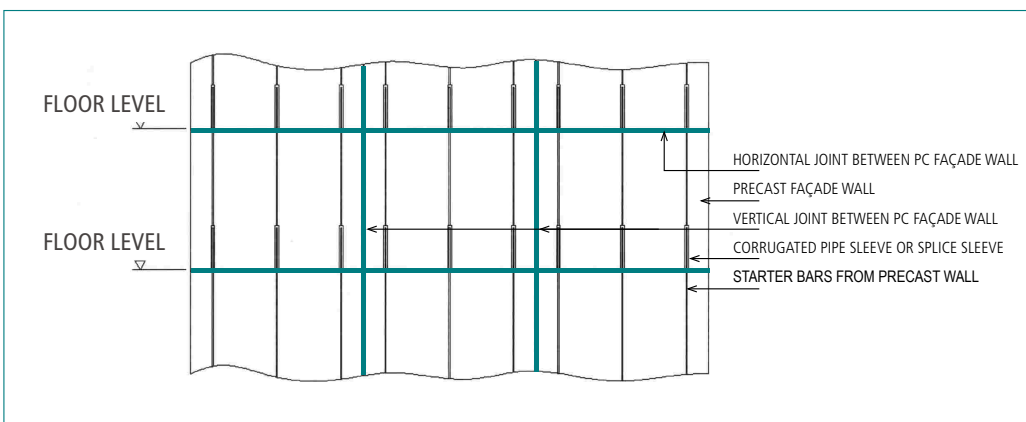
View A showing horizontal and vertical wall joints and splicing layout
